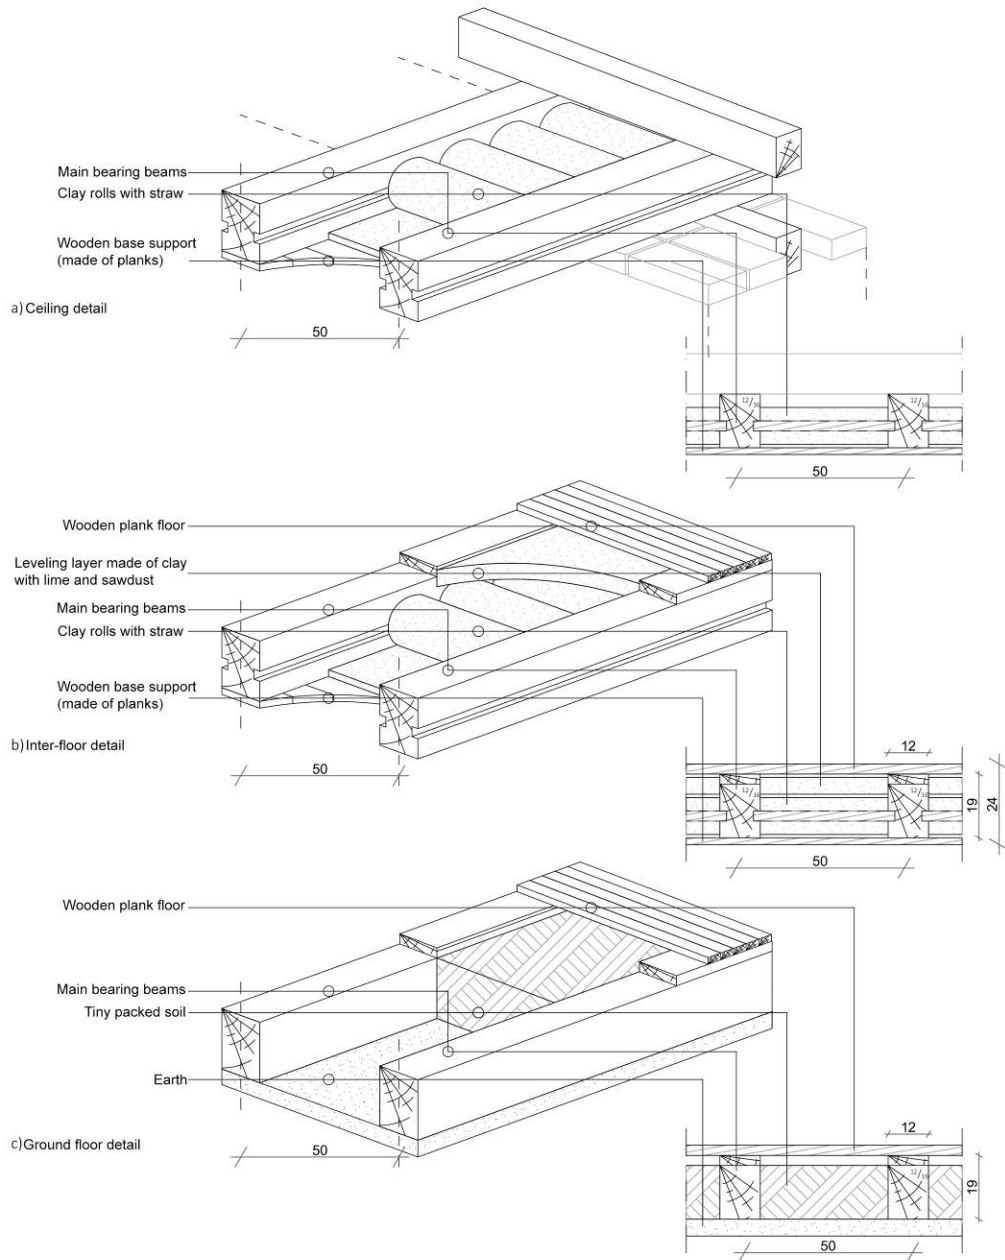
Construction details of Petrović family house in Laplje Selo, a) ceiling detail, b) interfloor detail and c) ground floor detail
